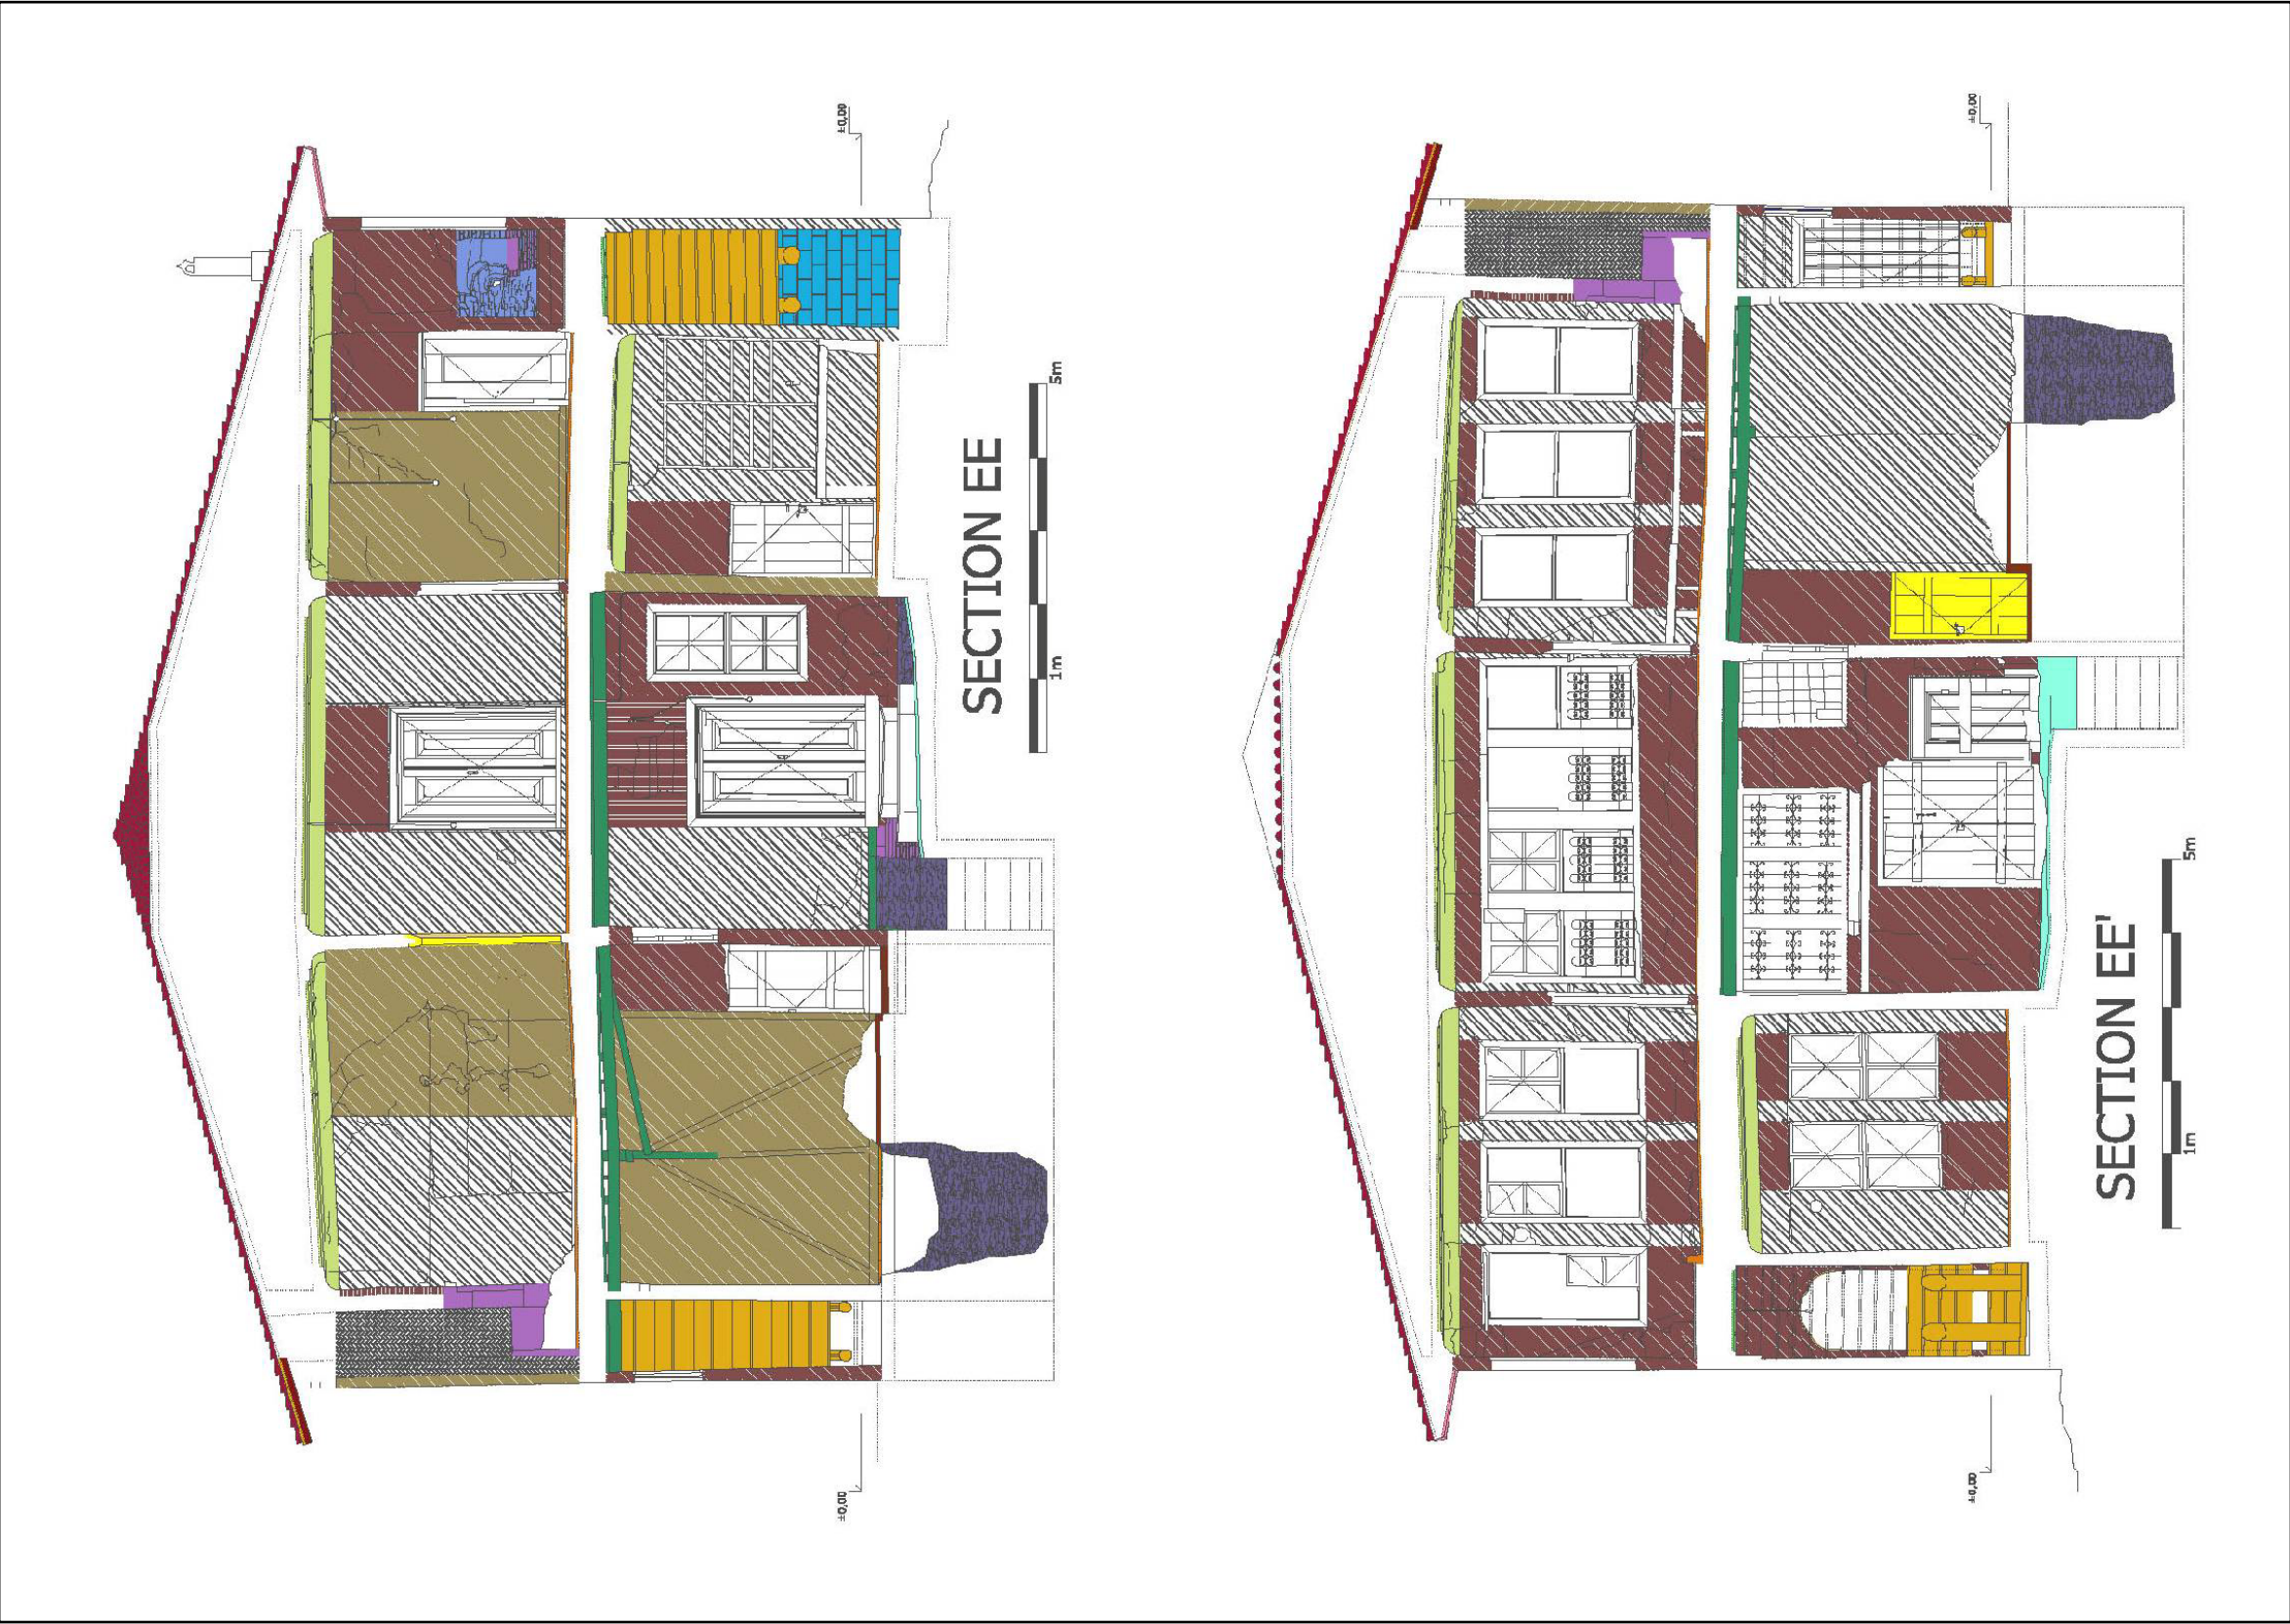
Analysis of Str. Syst. & Const. Tech.; Sections EE, EE'; 1/100 (Presented in 1/50 at Jury)
